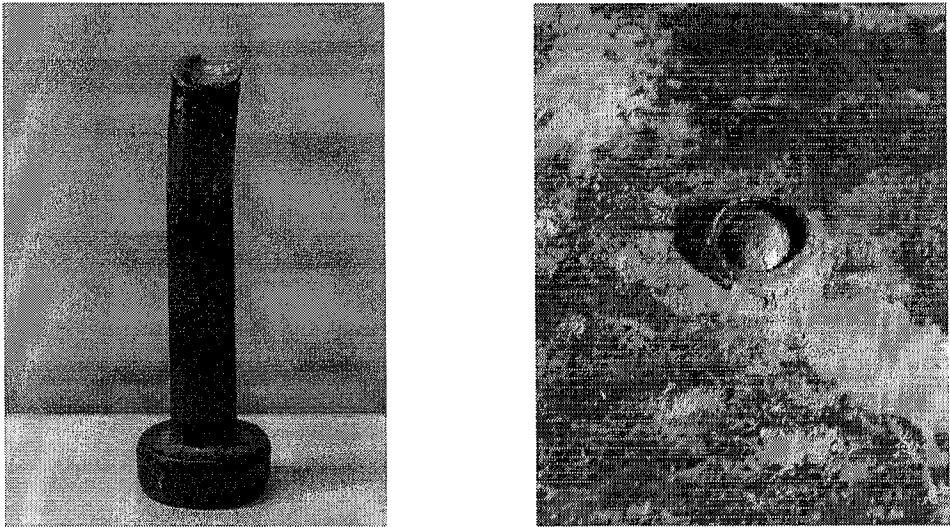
Fracture Shape of the Studs along the Top Interfaces
